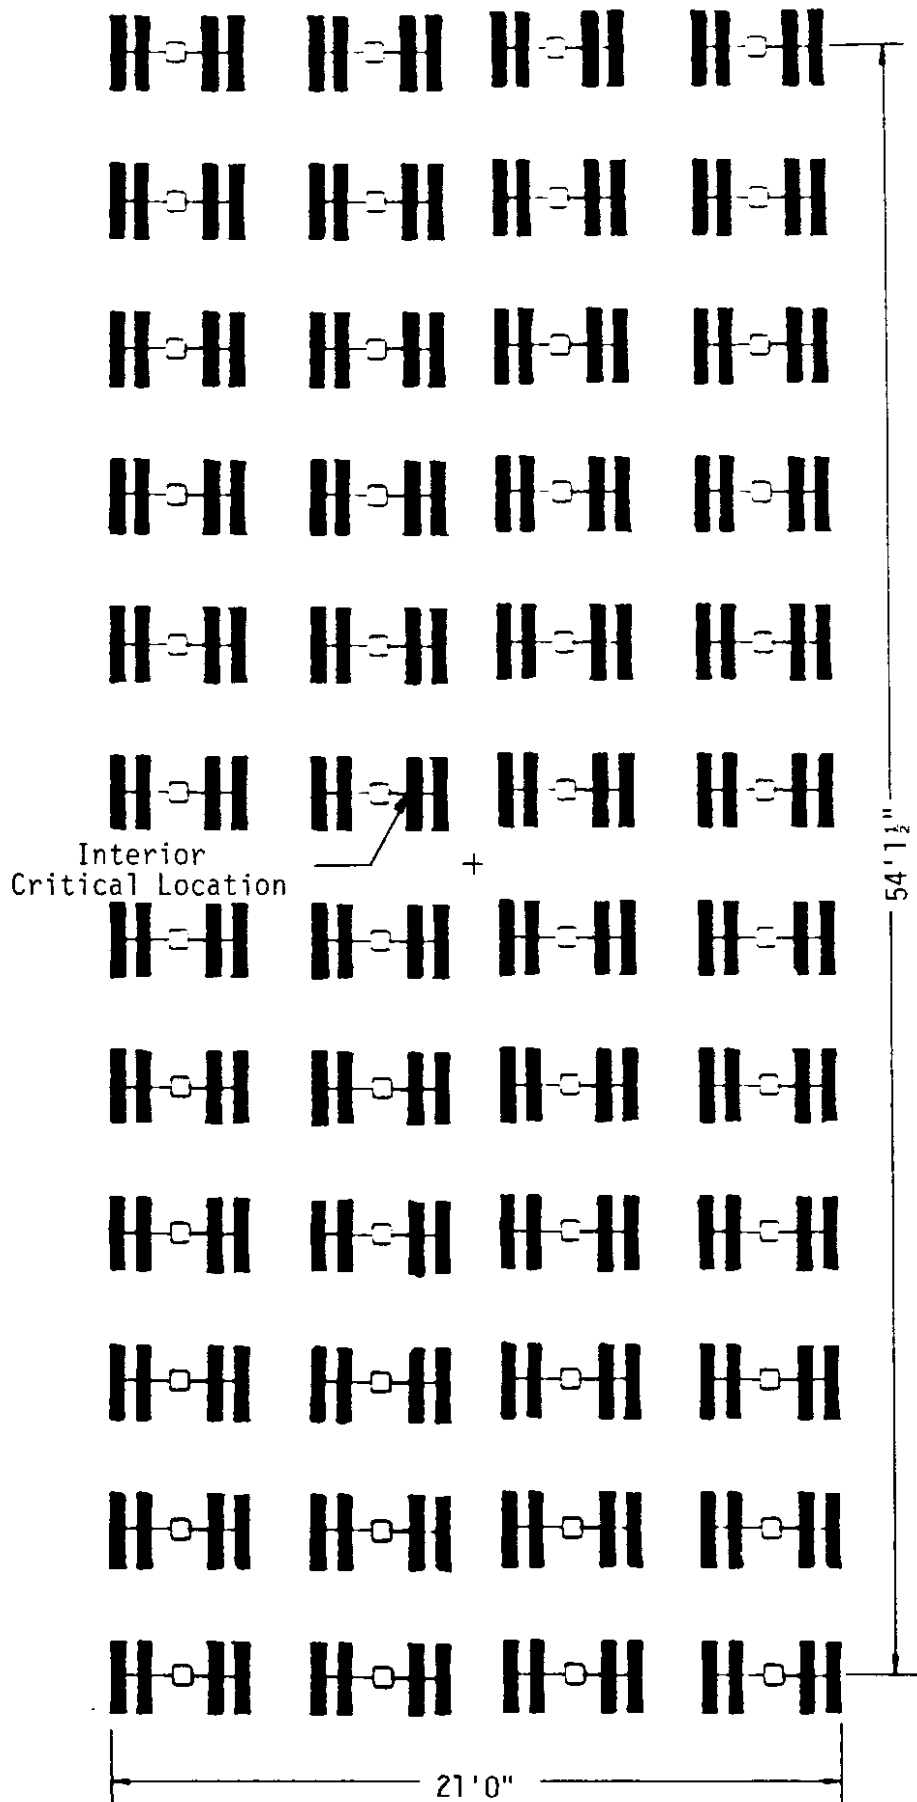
Plan View of One Trailer Unit (192 Wheels).
